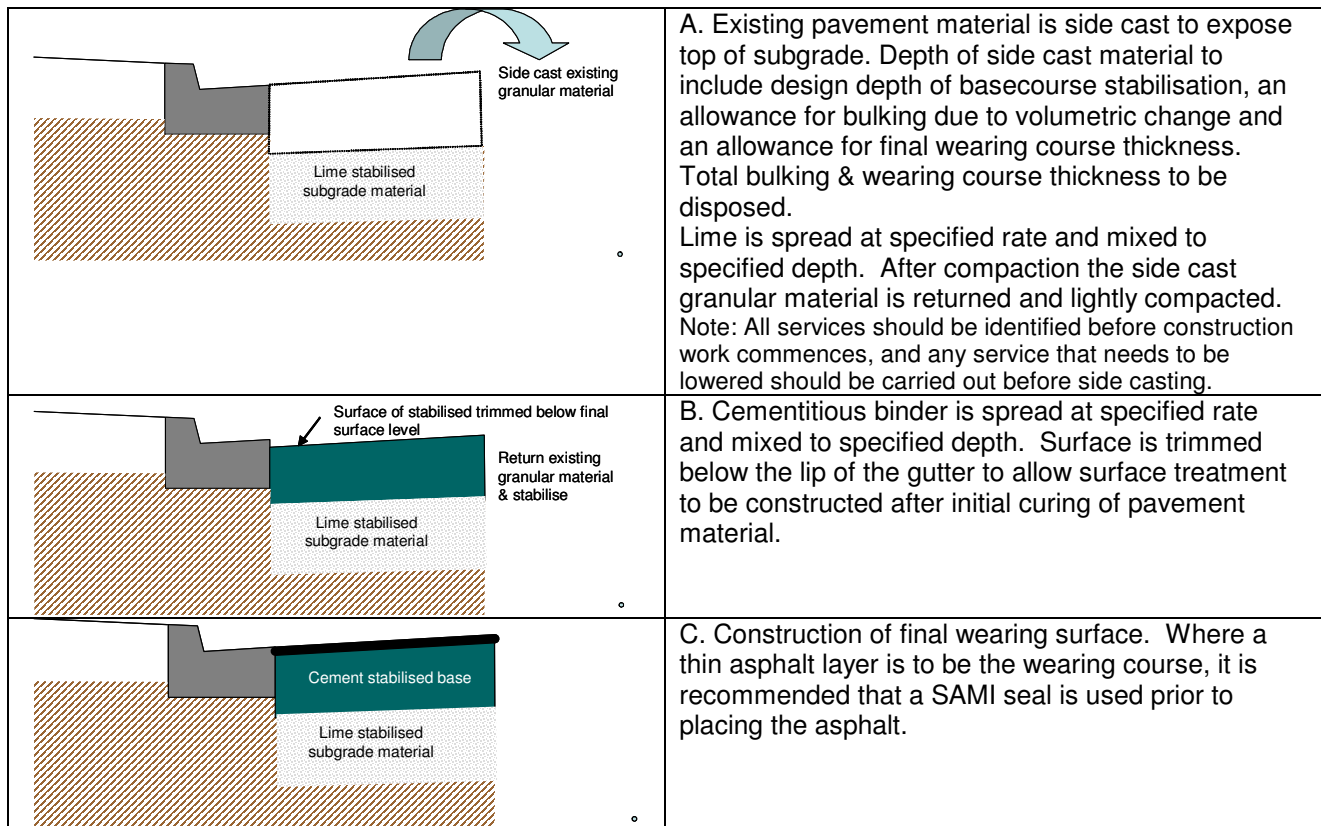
Subgrade stabilisation with existing kerb and gutter.
